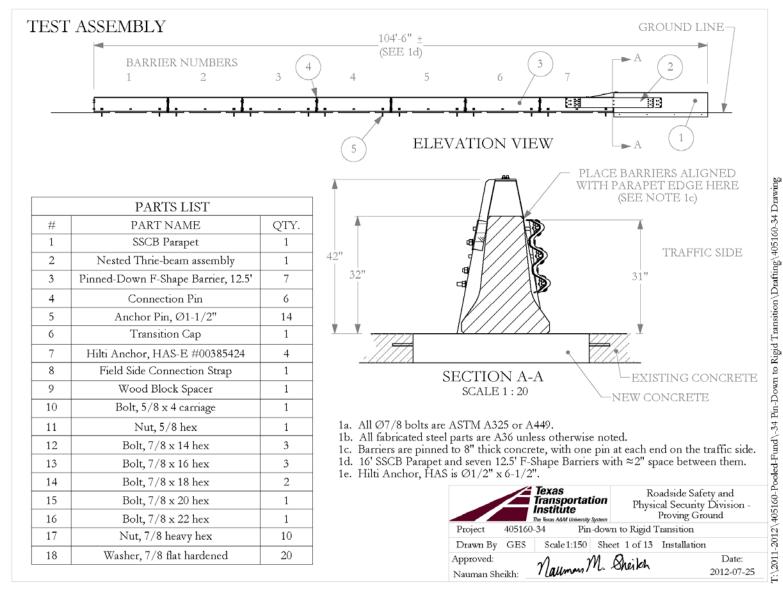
Layout of the transition design for anchored temporary barrier to rigid concrete barrier.
